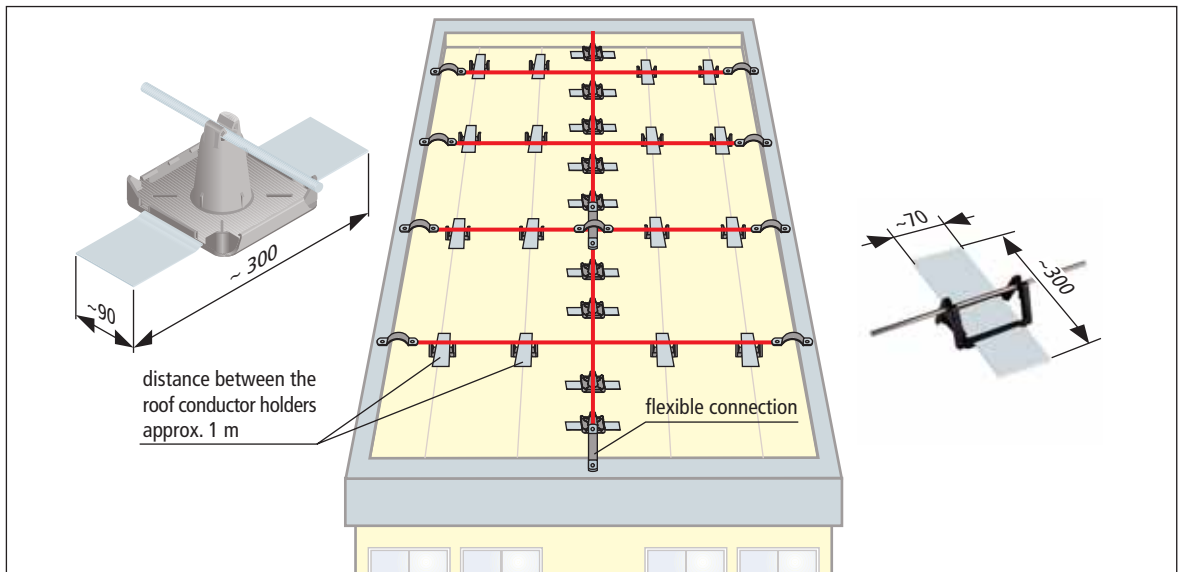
Synthetic flat roof sheetings – Roof conductor holder Type KF / KF2
